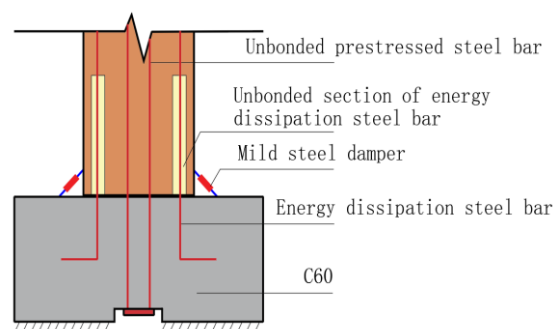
Structure Drawing of Prefabricated Self-Resetting Pier with External Mild Steel Damper
